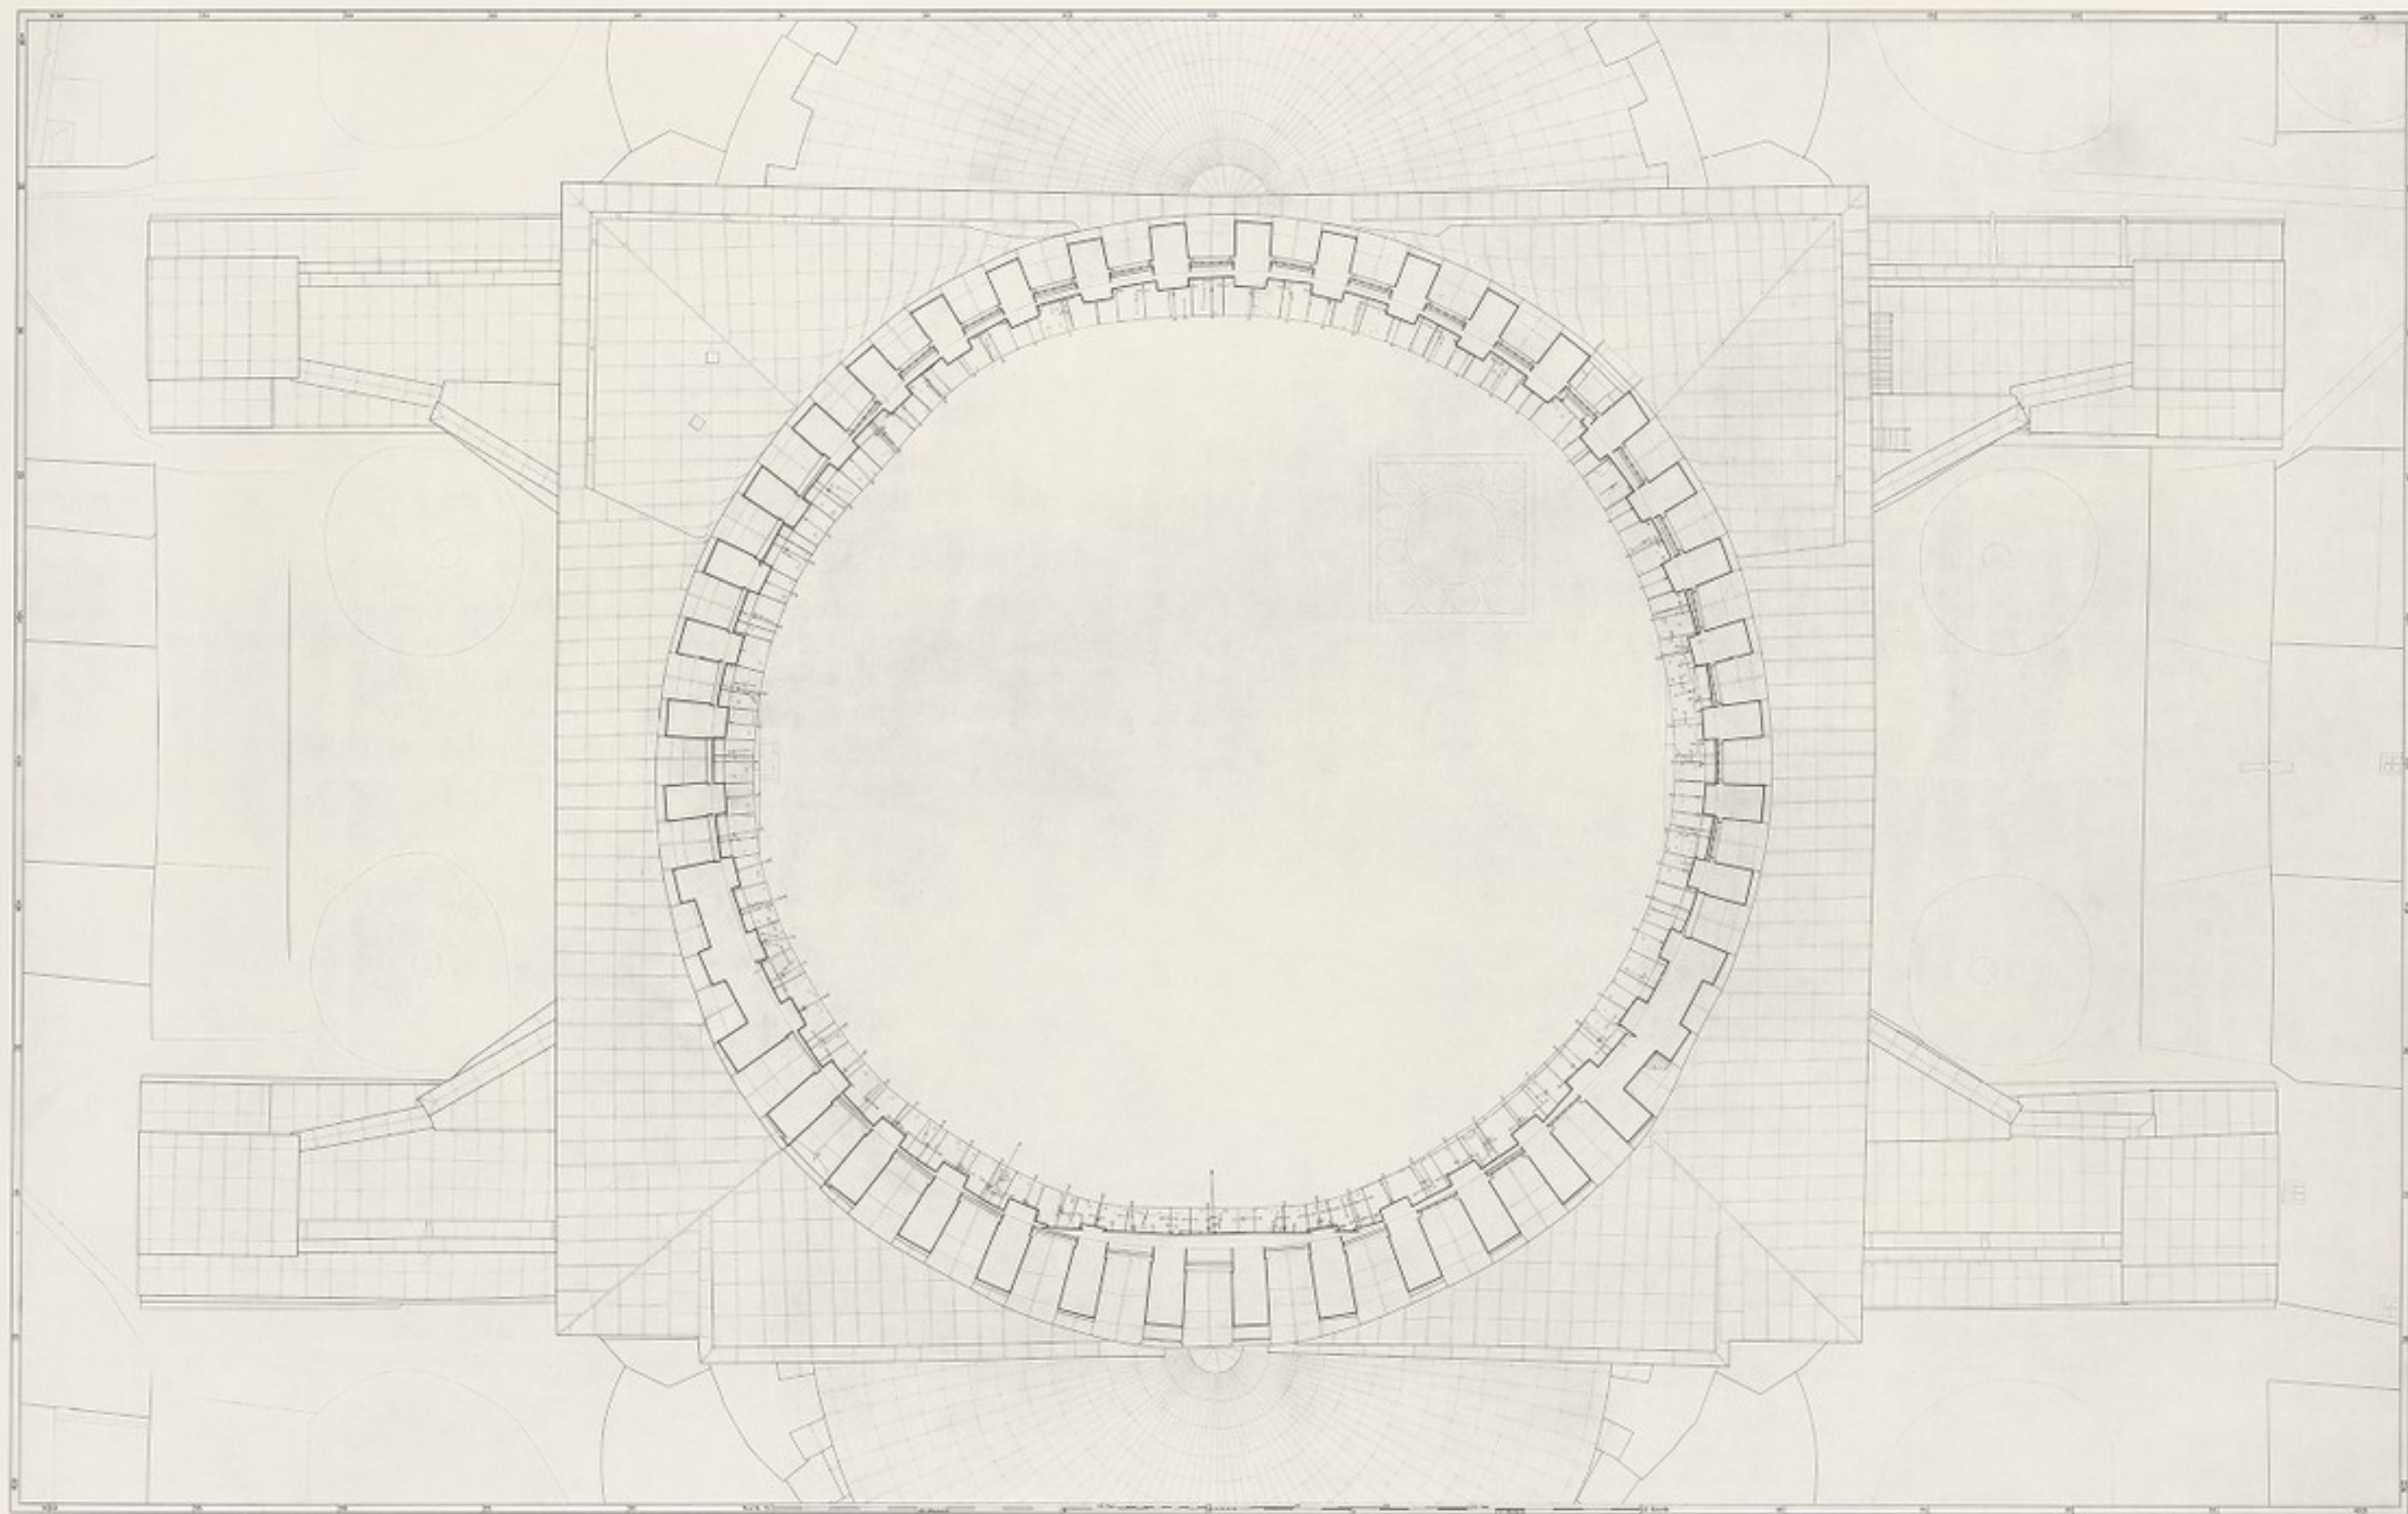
PLAN OF DOME AT CORNICE AND WINDOW LEVELS
